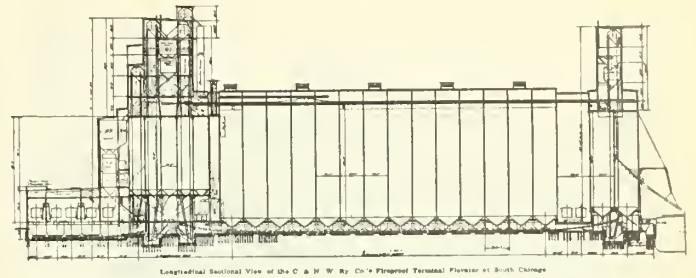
Longitudinal sectional view of the Chicago and Northwestern Railway Company's fireproof terminal elevator at South Chicago.
